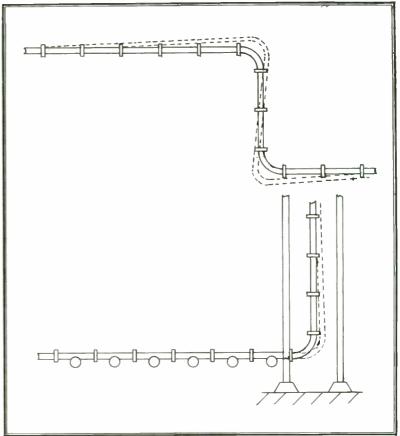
, PROPOSED ARRANGEMENT FOR A LONG HORIZONTAL RUN
